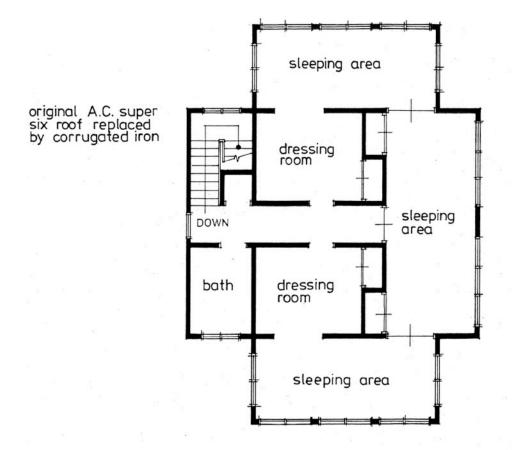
'Ground floor plan of house Type 'K' on Lot 1099' [Burnett House] (Hunt 7a).
